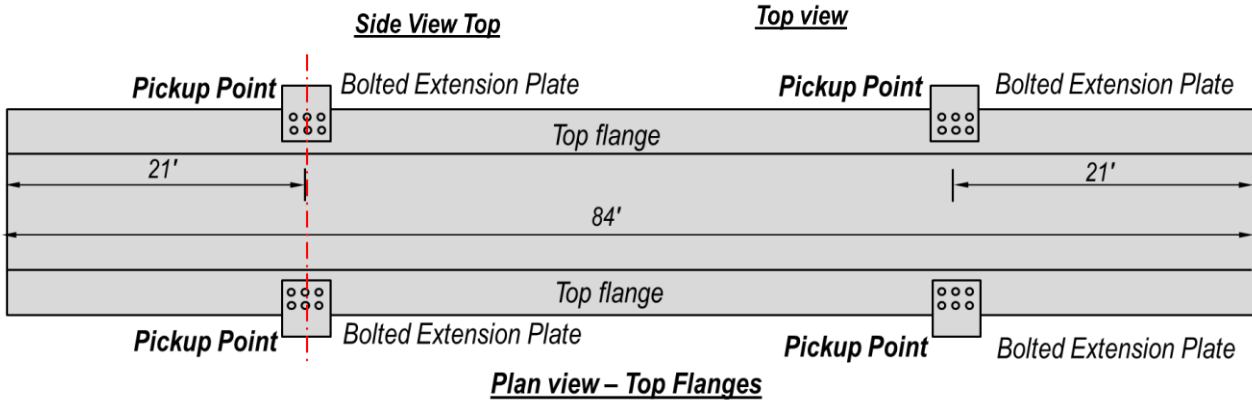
Bolted Extension Plates on the Girder Top Flange
